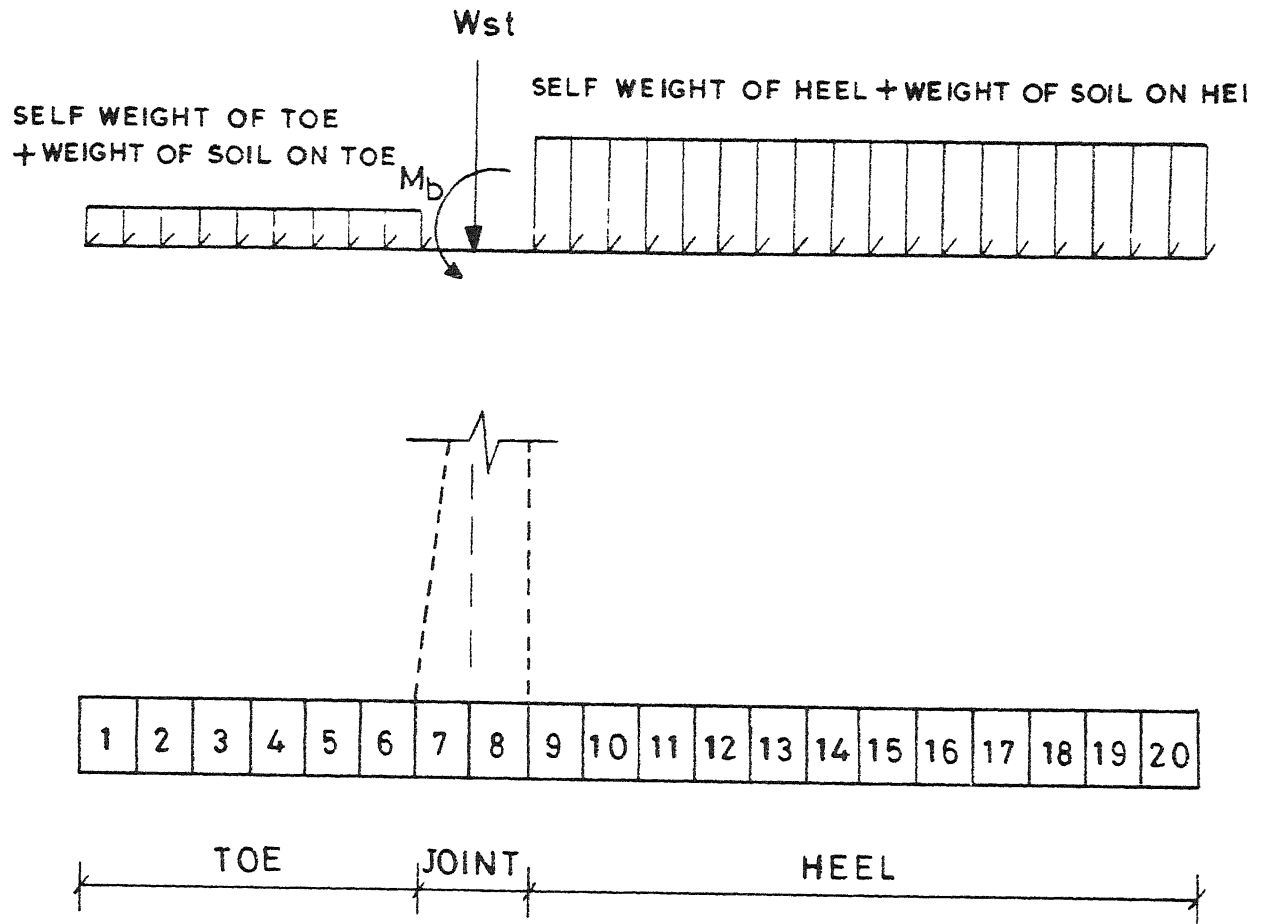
5 : DISCRETIZATION AND LOADING ON FOOTING
